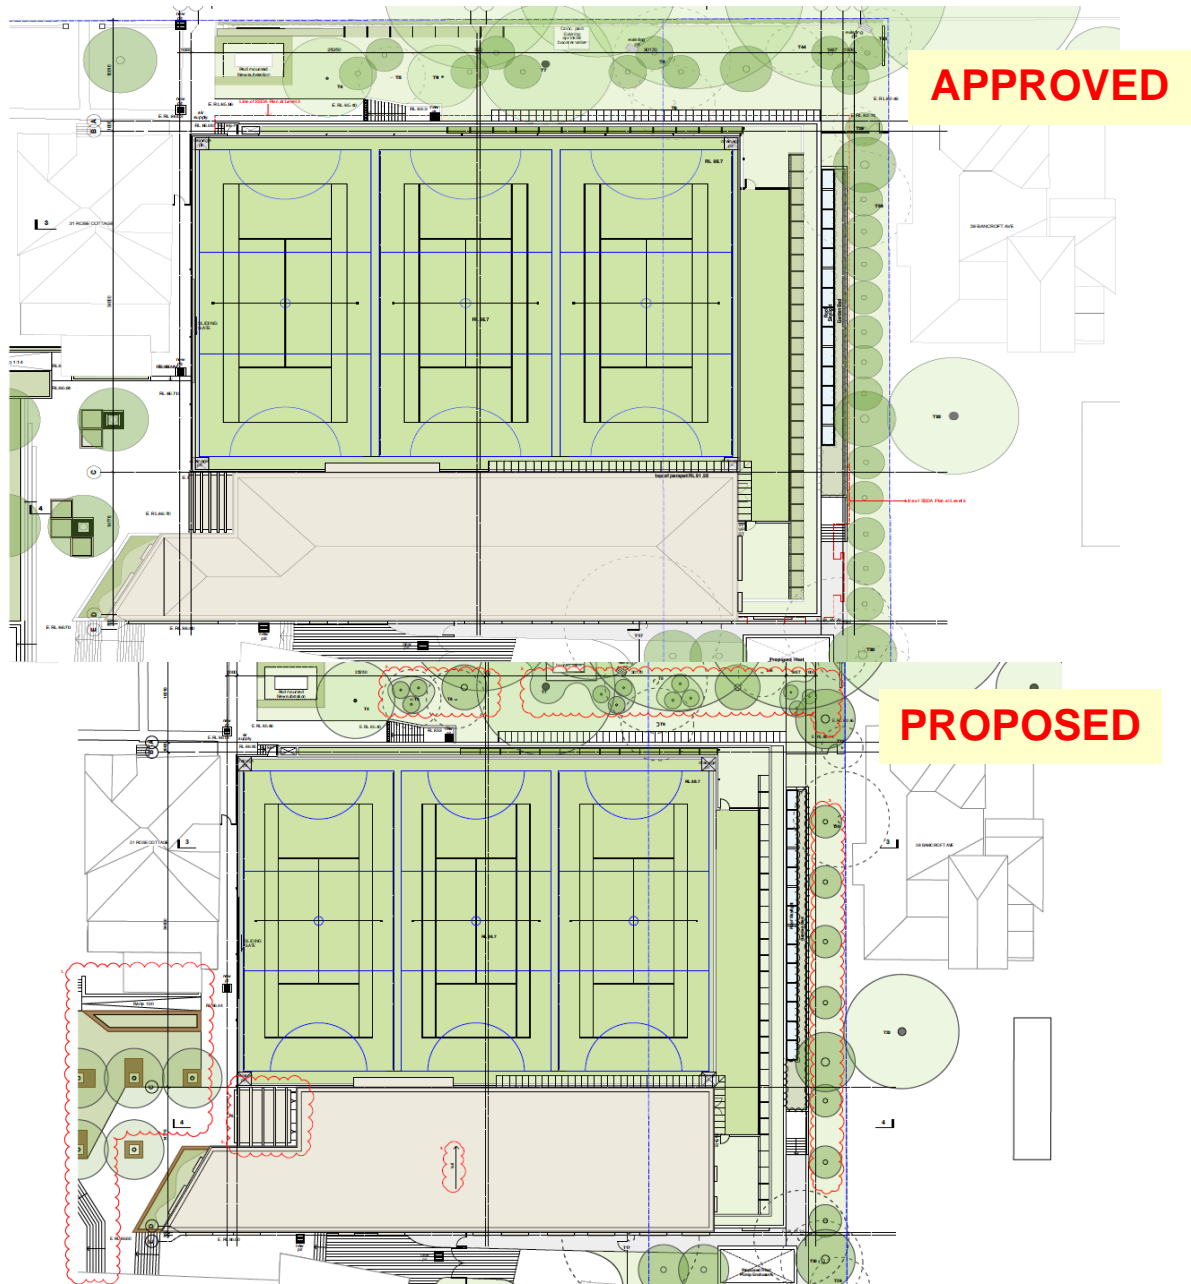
Details of the proposed landscaping amendments compared with what was approved
